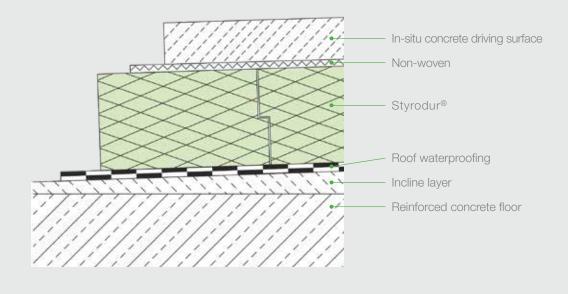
Basic outline of a parking roof with in-situ concrete driving surface on an inverted roof construction with Styrodur[®].
